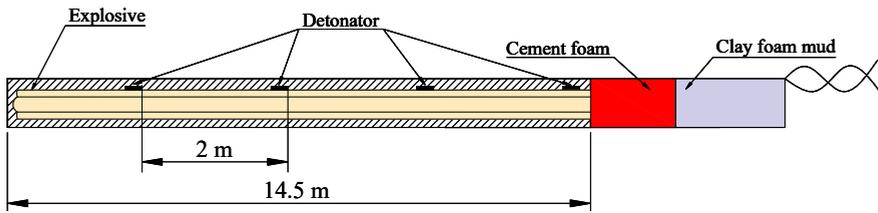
Presplitting drilling of two roadway roof blasting in advance area of the workplace
